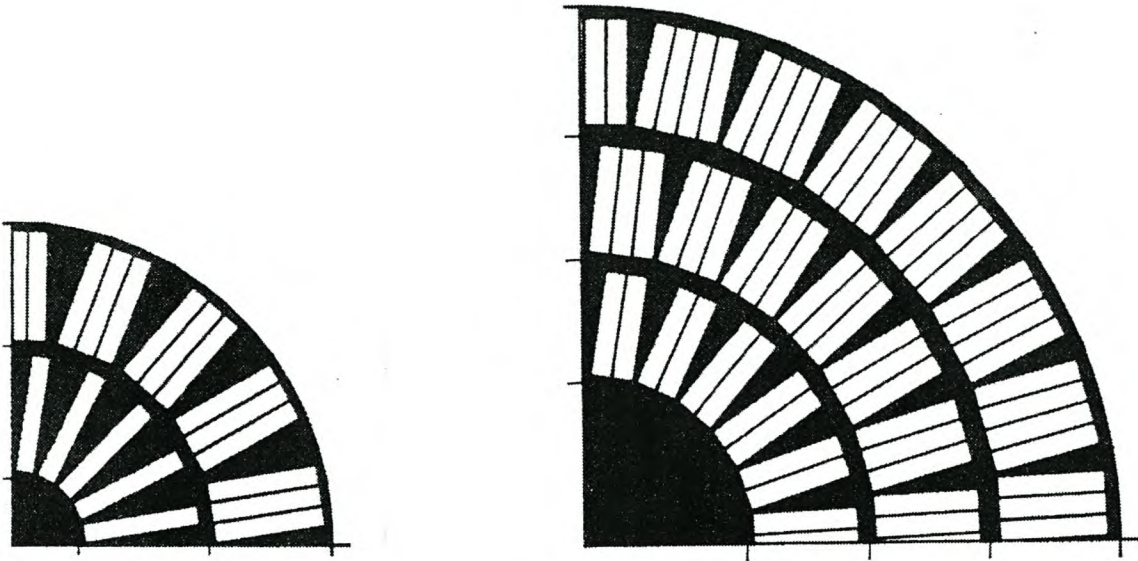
Arrangement of Heat Exchangers in Tower Cross Section
